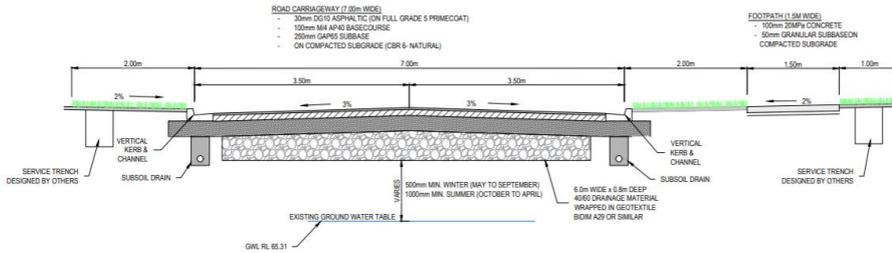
Cross Section for Roads 2, 3, 4, 5, 6, 7, 8, 10, 11, 12, 13 and Road 15
